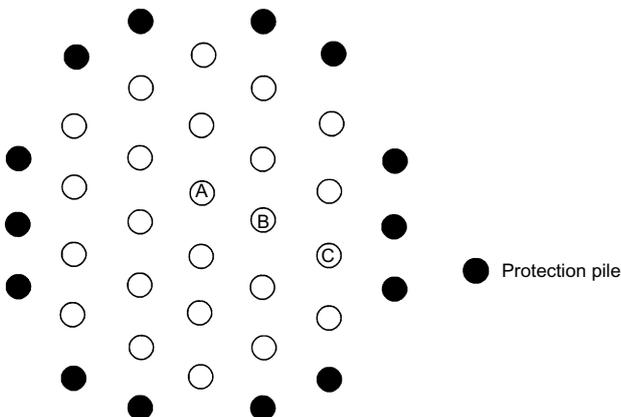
Configuration of group of 38 piles (Okabe, 1977)
